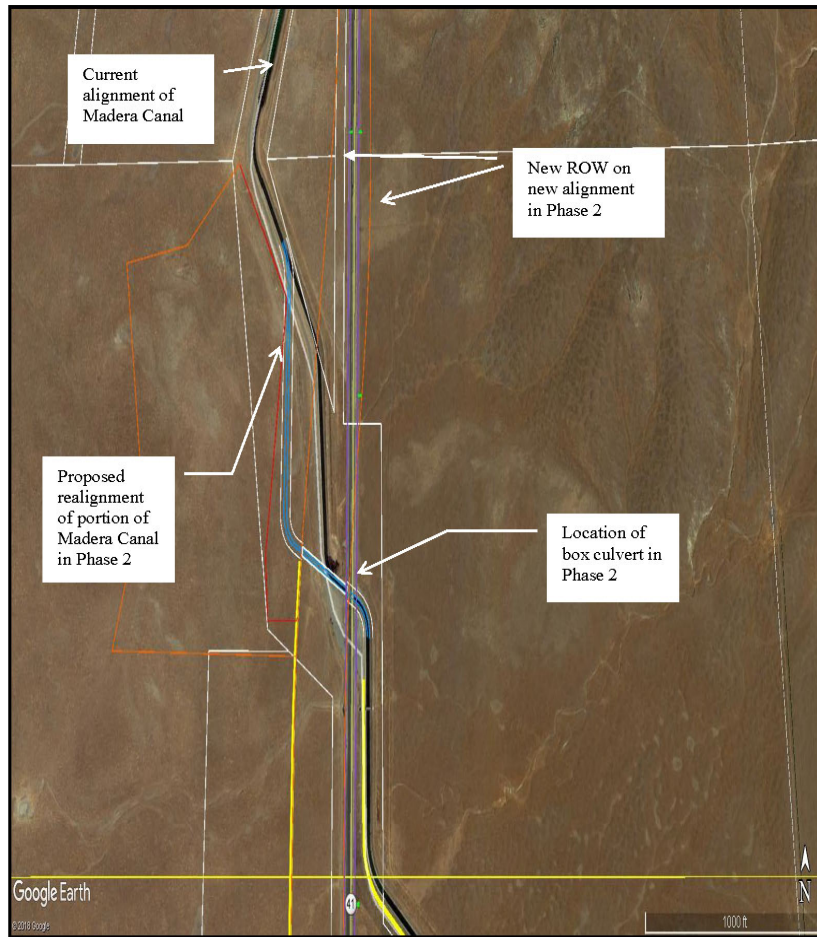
View showing existing Madera Canal intersecting SR 41 and proposed realignment of canal and location of box culvert in canal.
